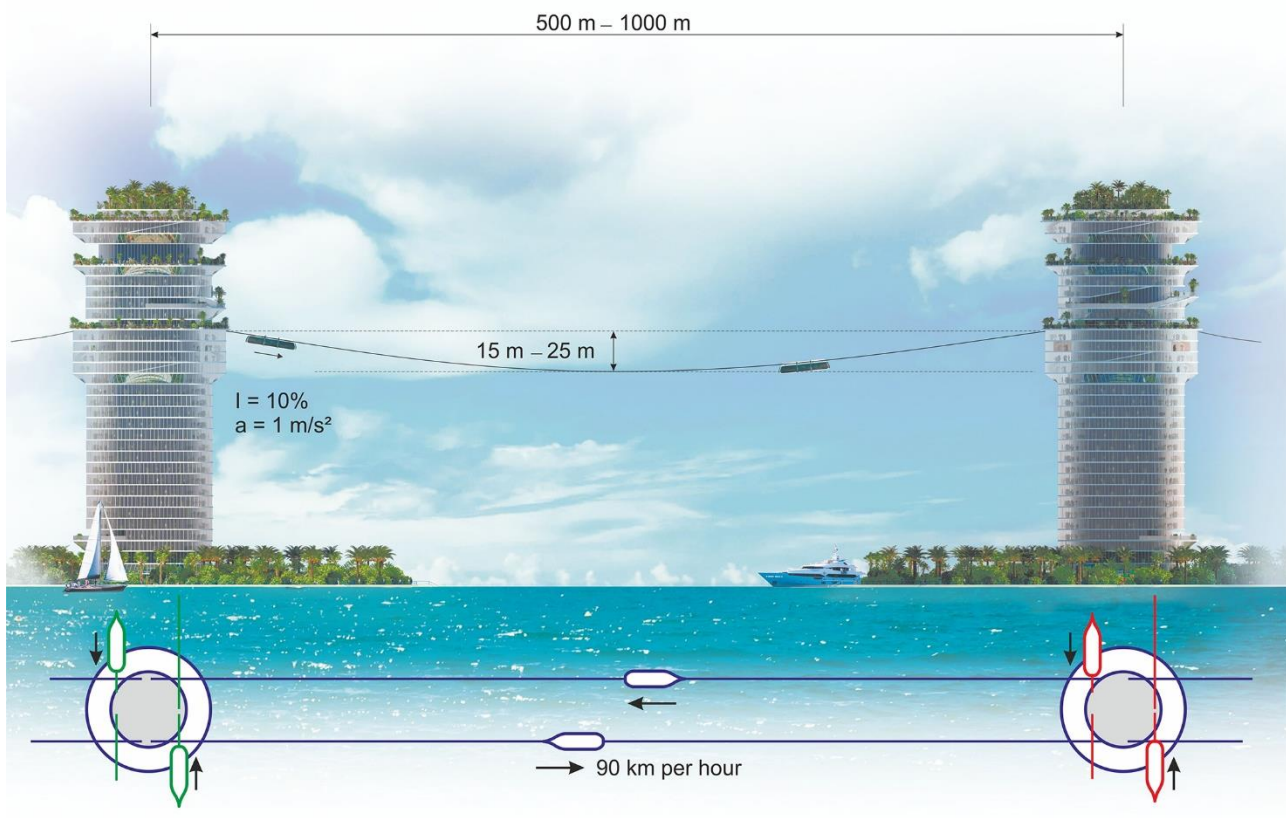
Section of the city line overpass with slacking string-rail track between adjacent stations in high-rise towers
